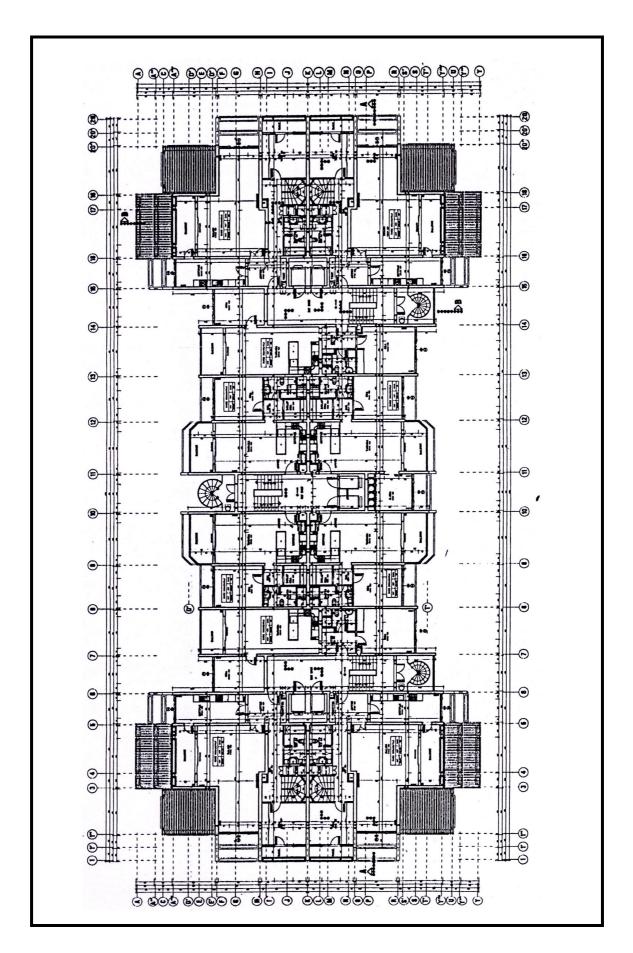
Mavişehir II; Kuğu 19th-Floor Plan
